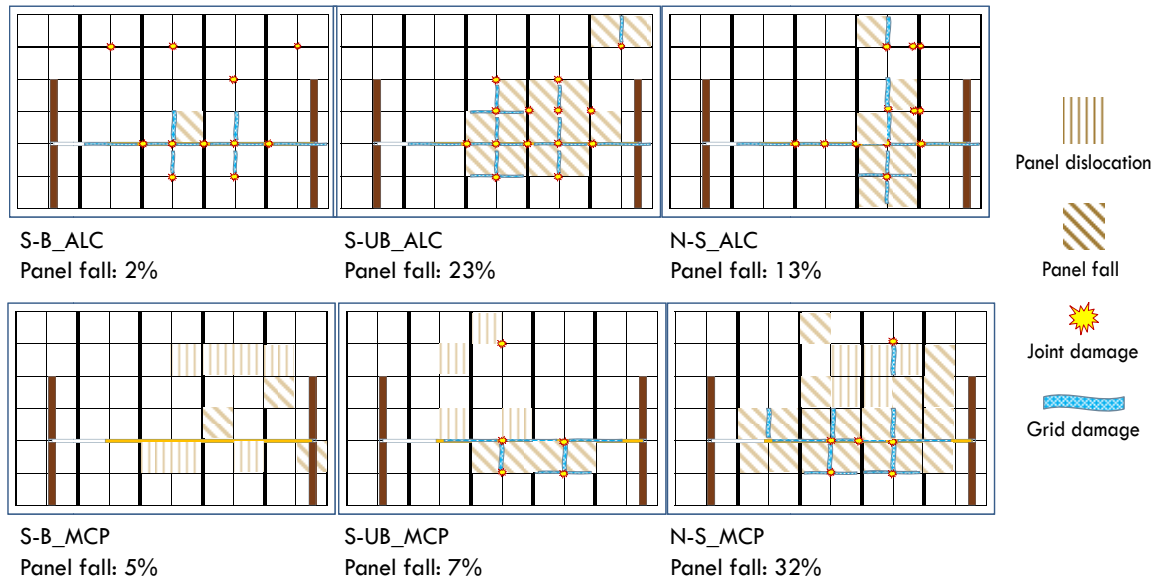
Summary of ceiling damage distribution of the tested CPC specimens
